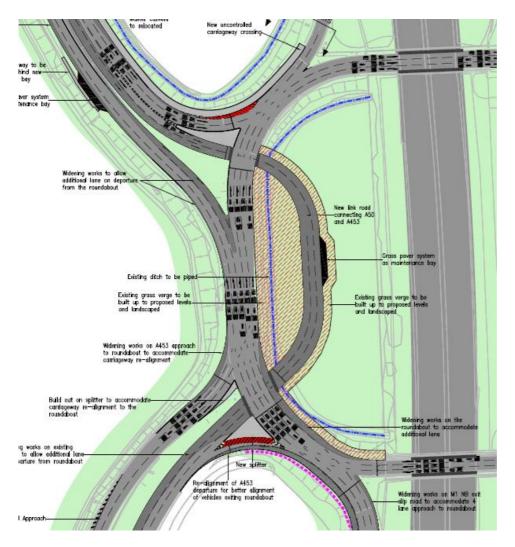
Junction 24 'pinch point' scheme layout showing the cut-through
